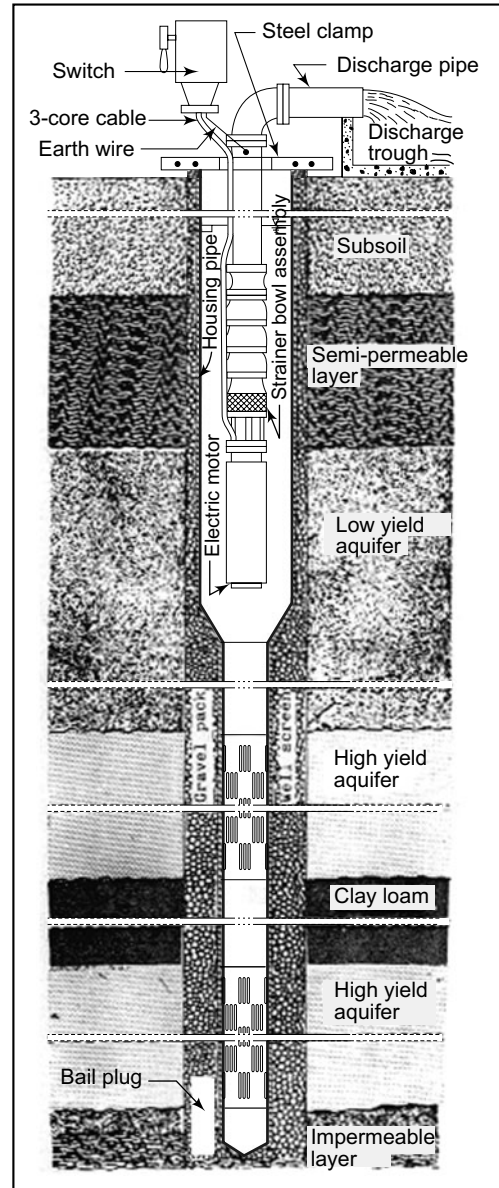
Arrangement of tube well assembly, gravel pack and a submersible pump in a deep tube well (Sectional view). Note that the well screens are located against the water bearing formations and blind pipes against non-water bearing layers
